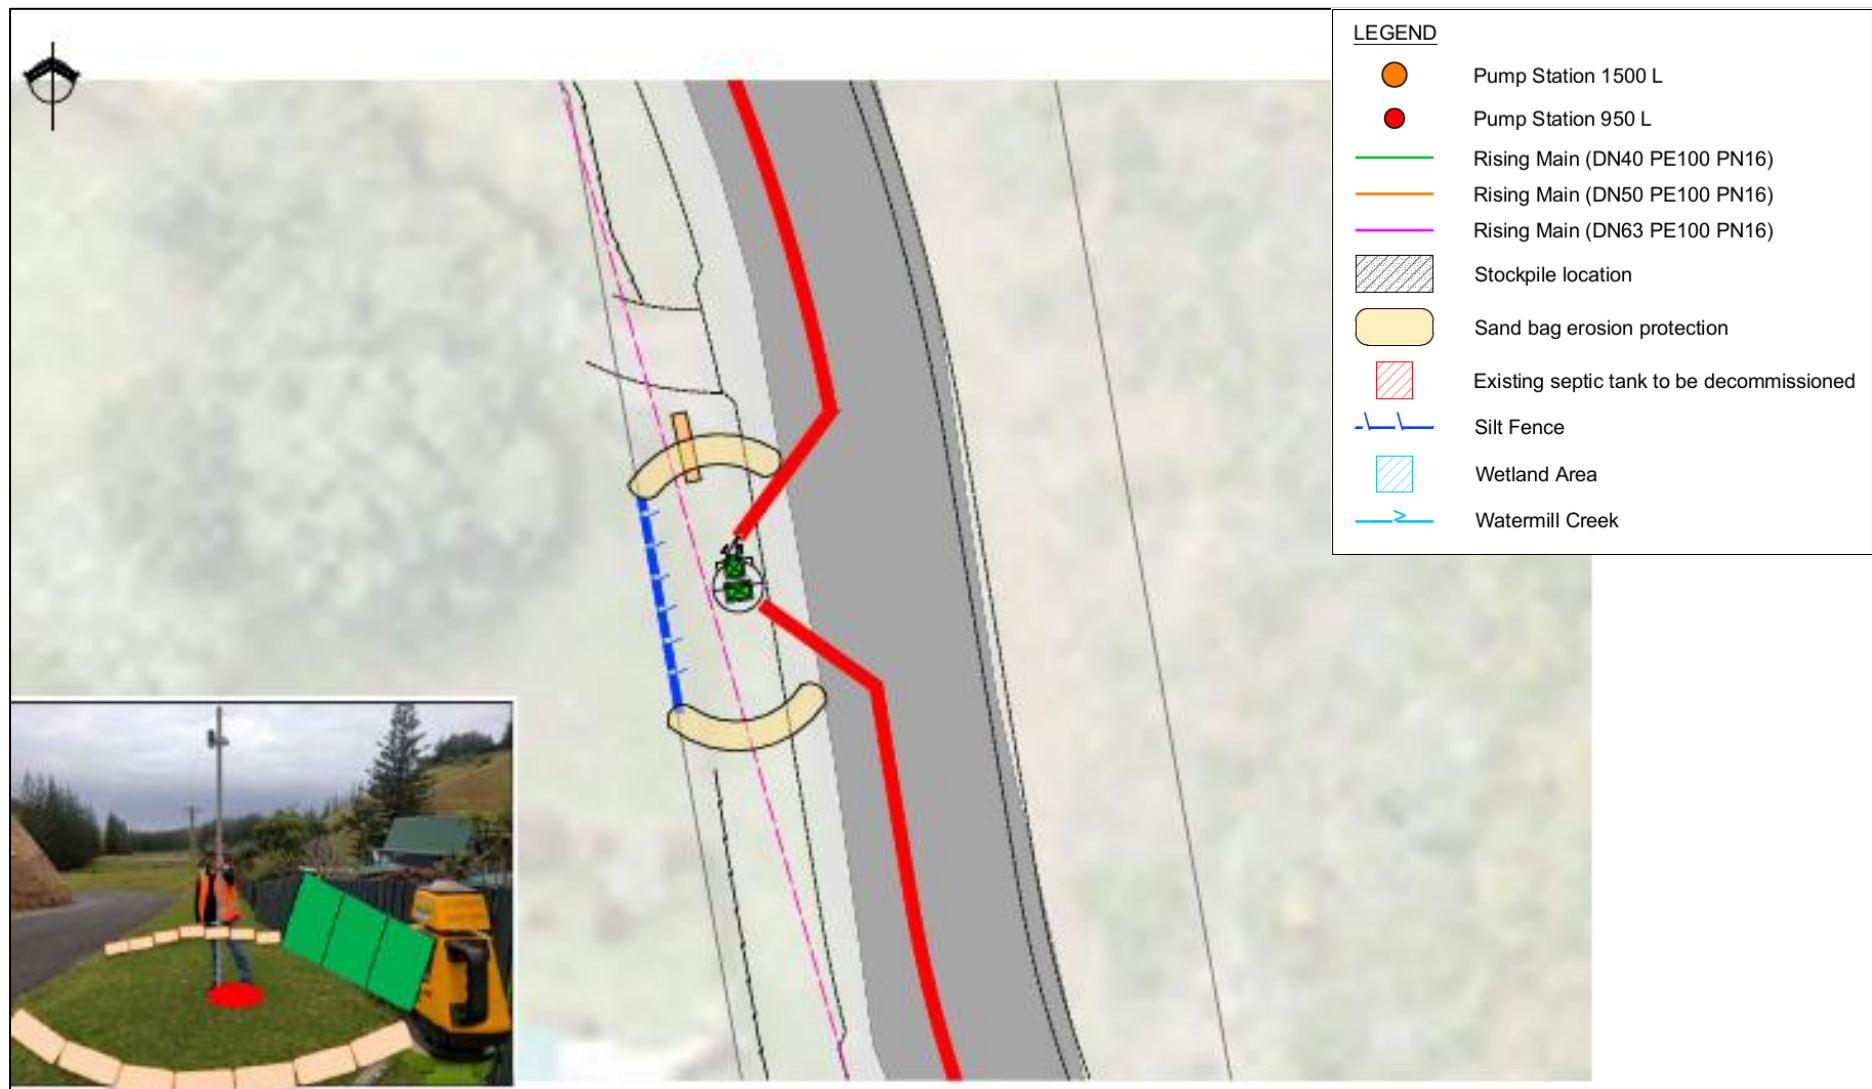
Erosion and Sediment Control Plan (indicative) – PS4 site
